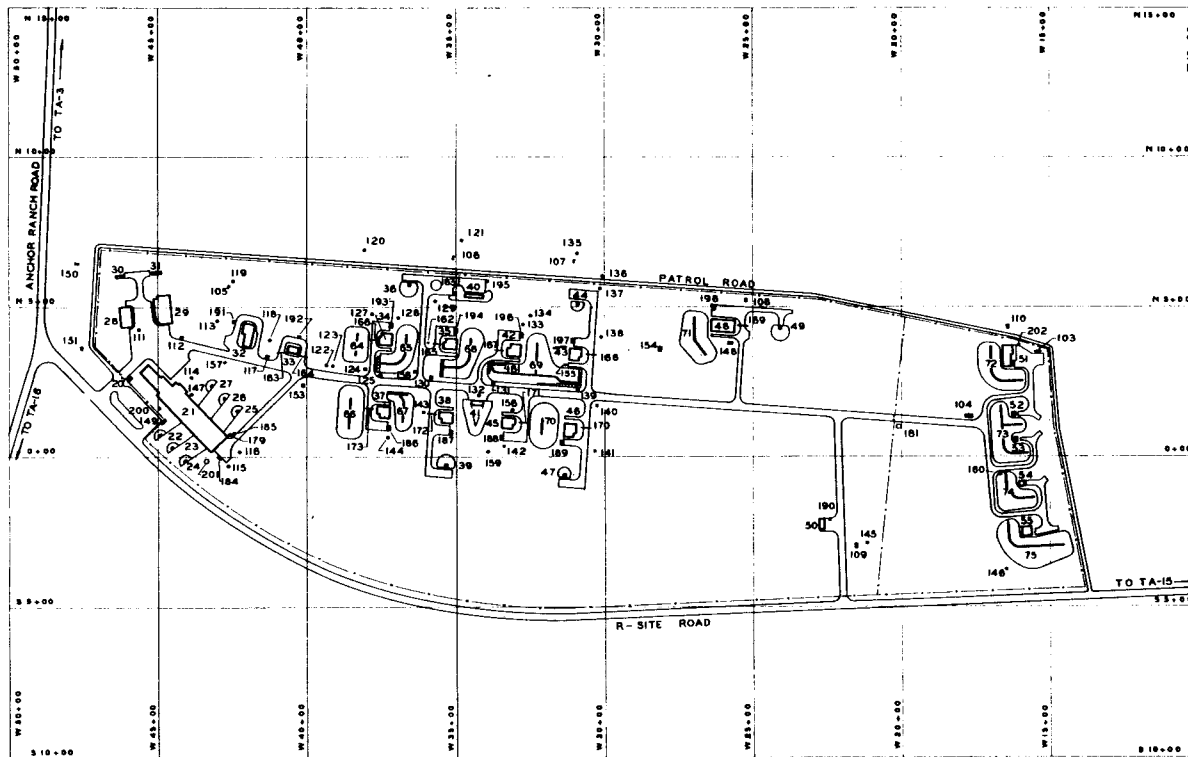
Structure Location Plan for TA-9 - New Site Replacing Anchor East (1955 Drawing from the LANL Technical Area Structure Location Plans)
